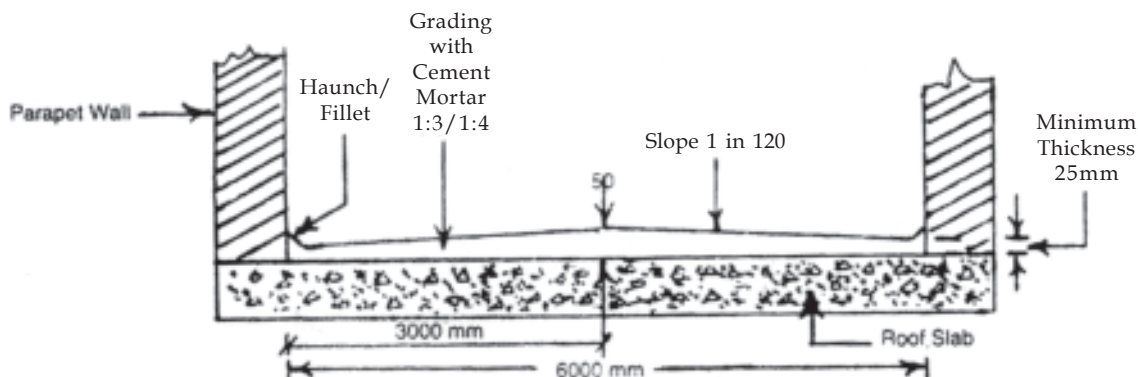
Grading with Cement Mortar 1:3/1:4 and Maximum Width of Roof Slab that can be covered
